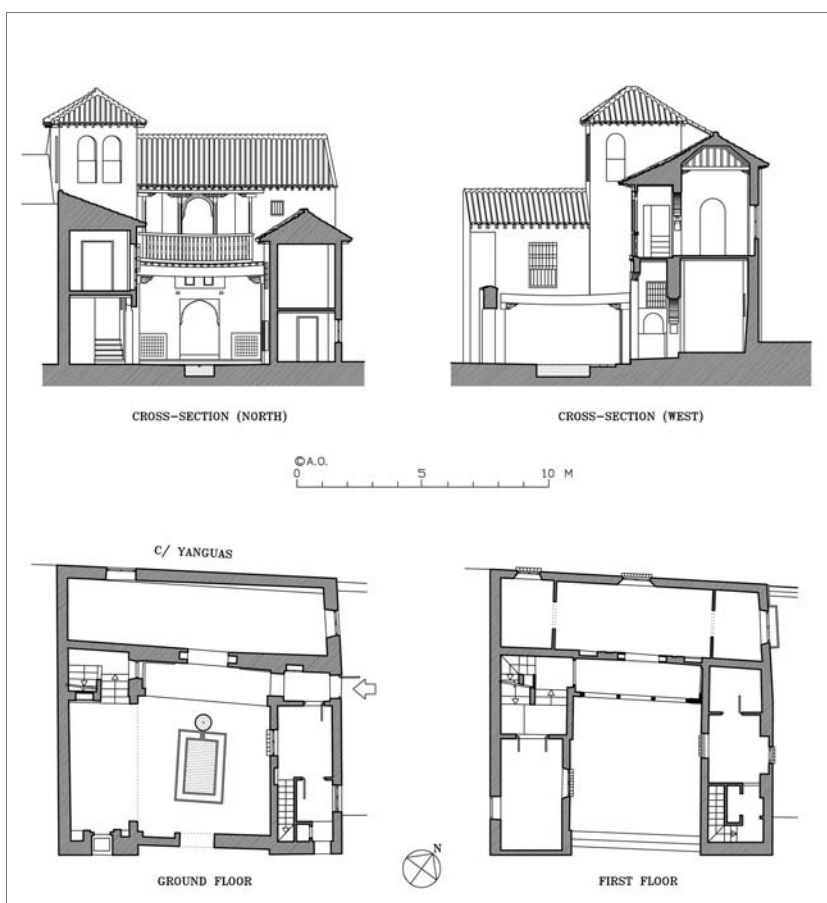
House at No. 2 Calle de Yanguas: plans and cross-sections.
